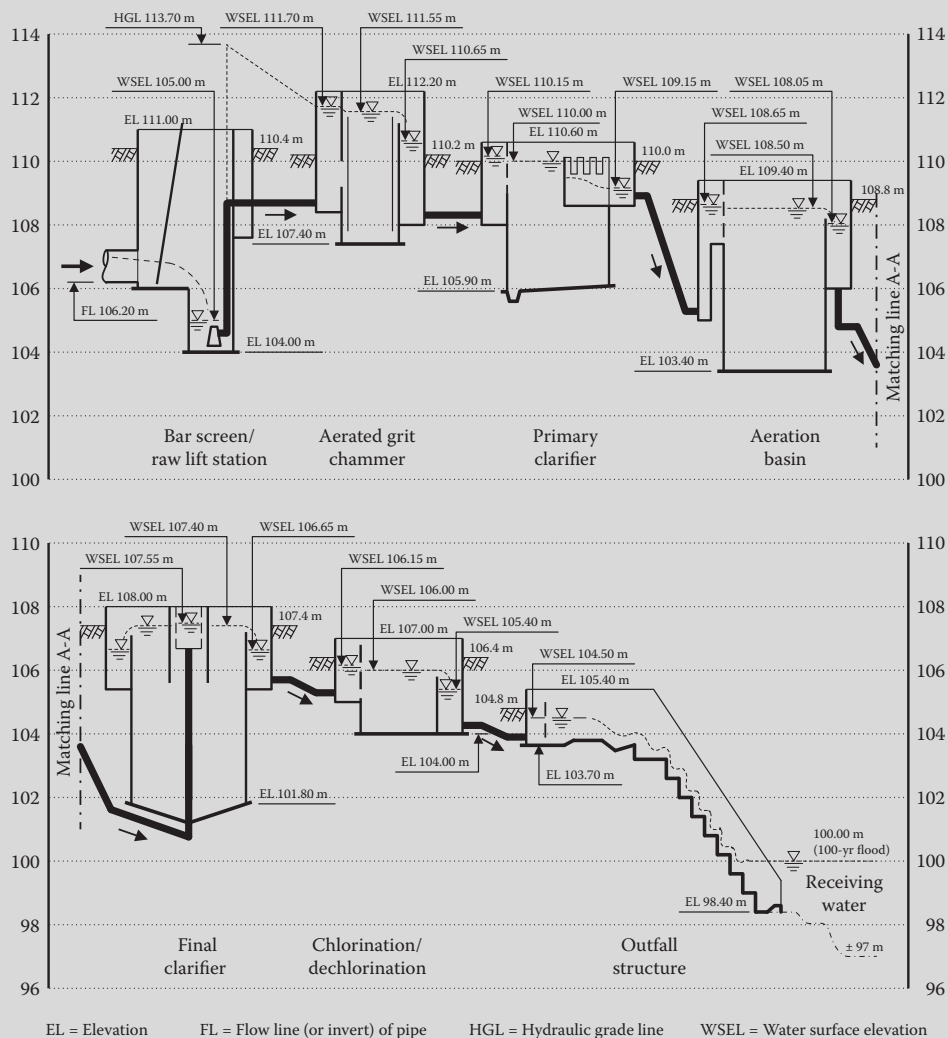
Hydraulic profile through the wastewater treatment plant with key elevations (Example 14.6).
